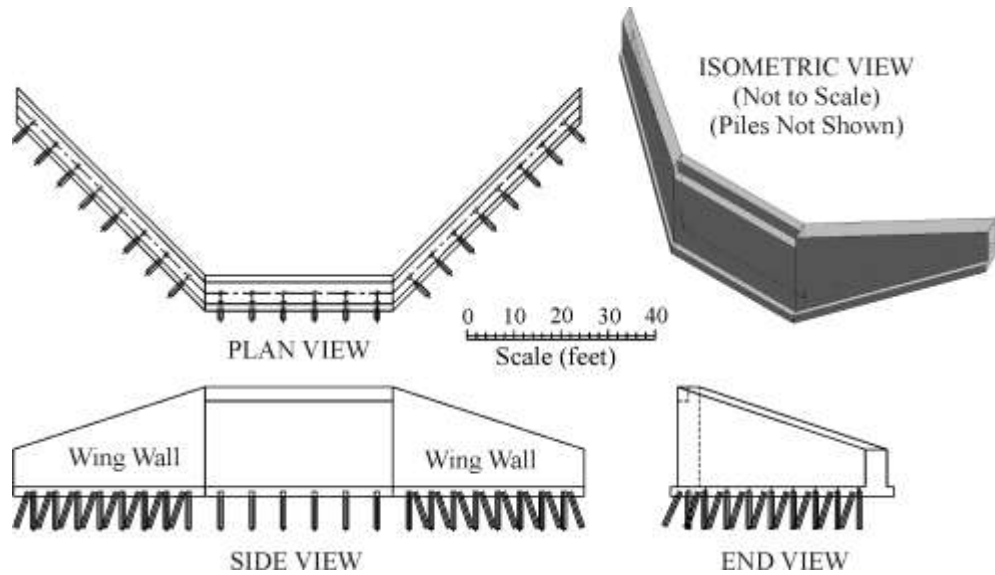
The geometry and dimensions of a wing-wall abutment - compacted earthfill embankment extends back from the abutment structure (prototype scale indicated); design provided by the Iowa DOT
